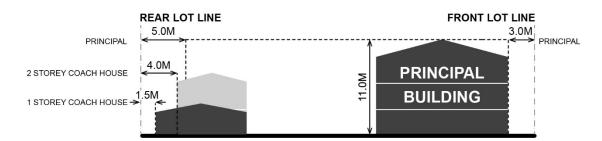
R1.2 Principal Building and SSMFH Coach House Setbacks Cross Section
